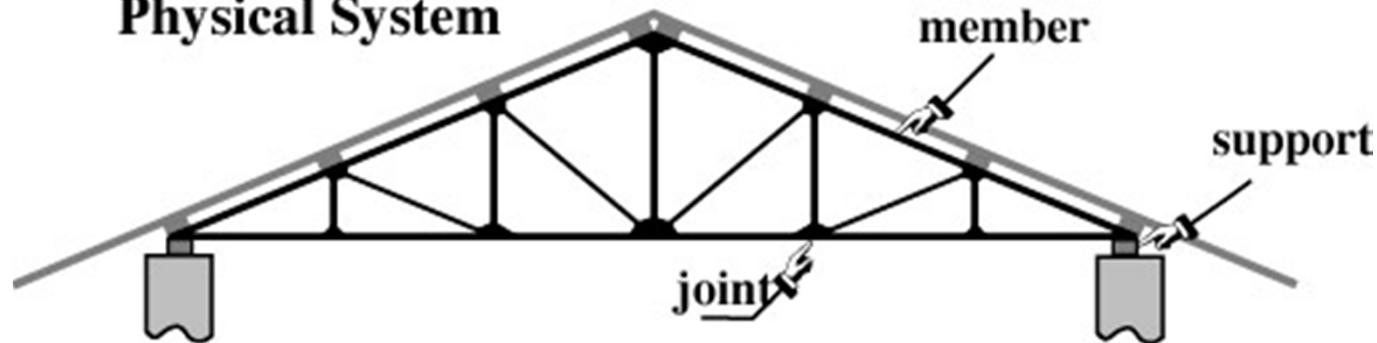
An actual plane truss structure. That shown is typical of a roof truss used in building construction for rather wide spans, say, over 10 meters. For shorter spans, as in residential buildings, trusses are simpler, with fewer bays.
